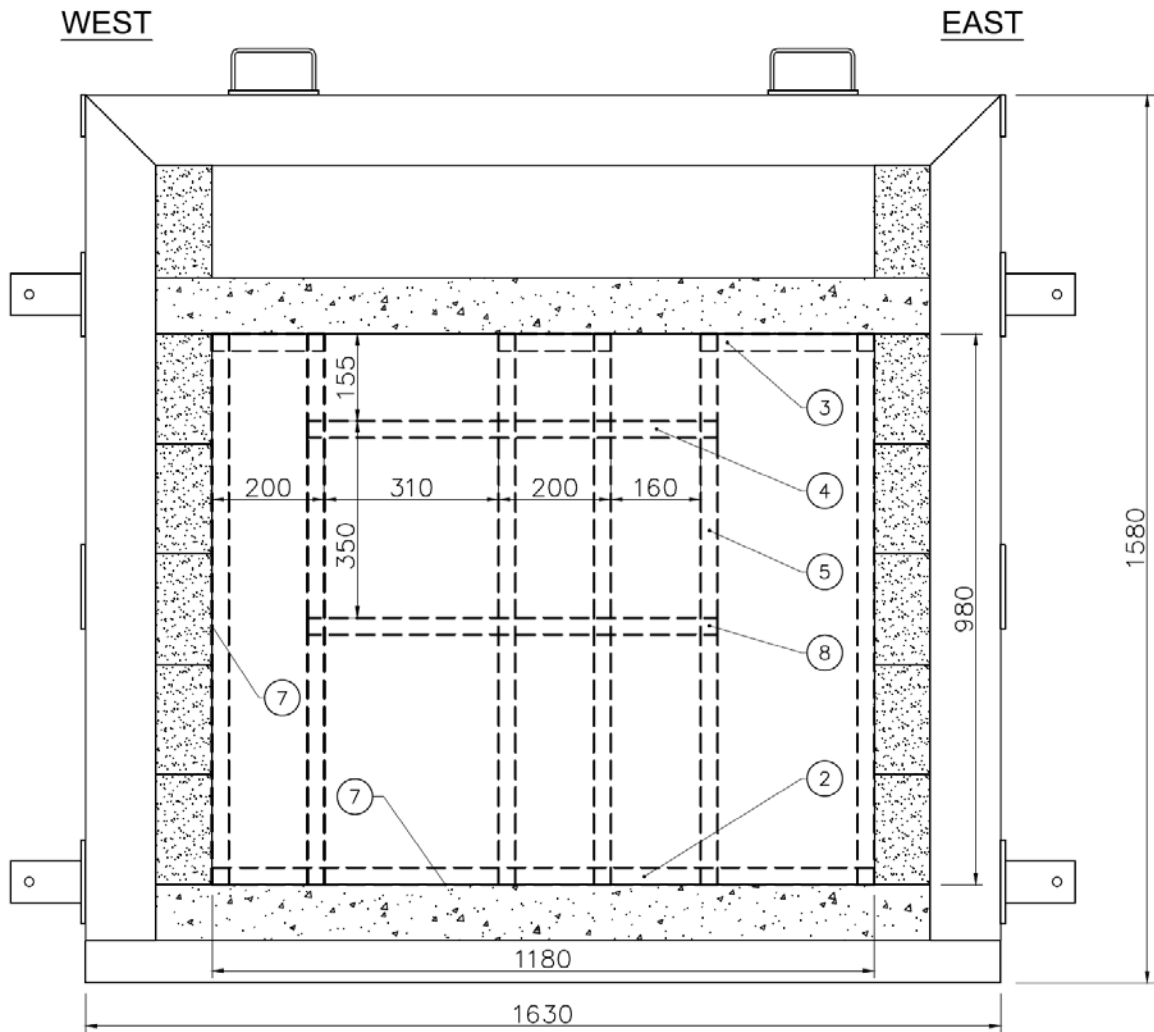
Elevation of Test Specimen – Internal frame, Unexposed side
